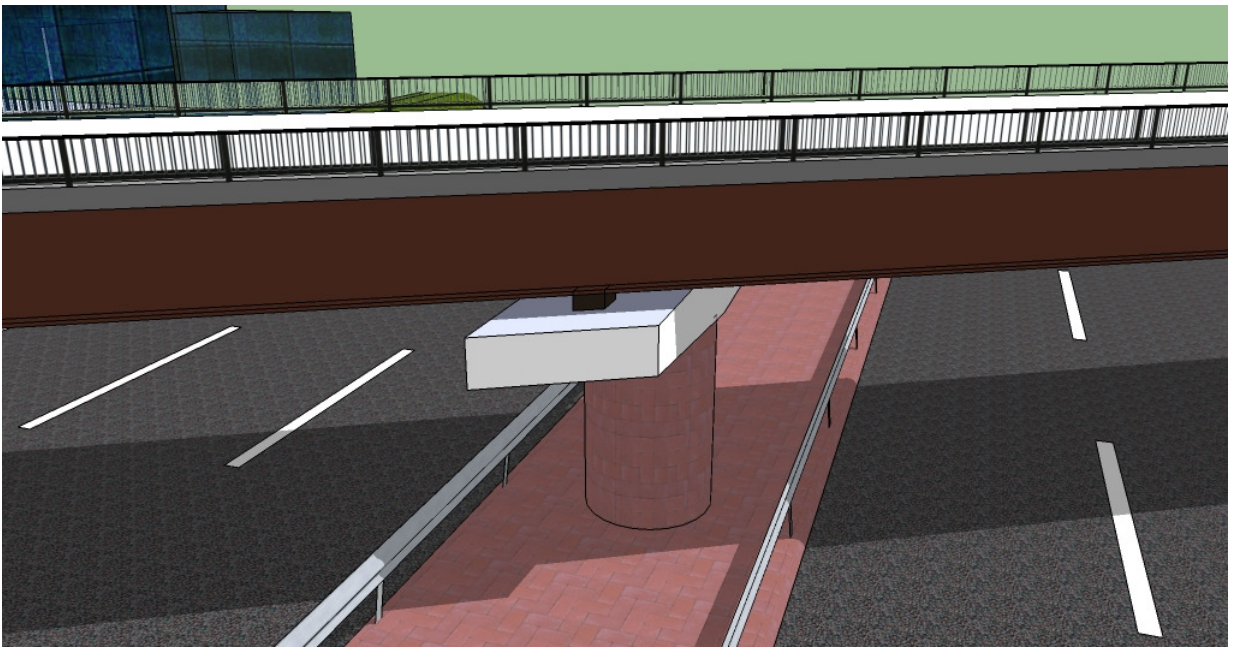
B: Three dimensional view of the bridge deck slab on steel girders, bearings and parapets
